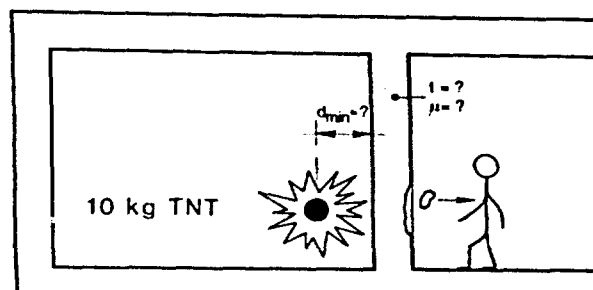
Example: Design of a Dividing Wall in an Ammunition Factory
